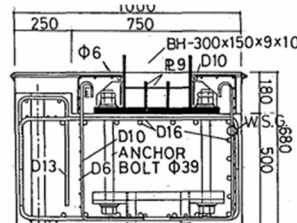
(b) Longitudinal section of A-Type specimen (B-B section of Fig. 2(a)) (unit mm)
